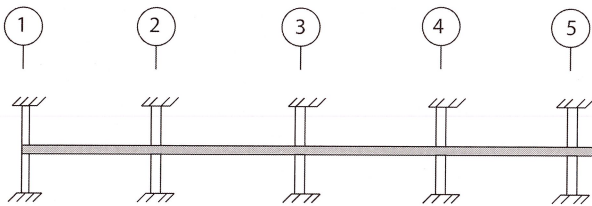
Elevation of design strip at Column Row B (after Reference 2)
